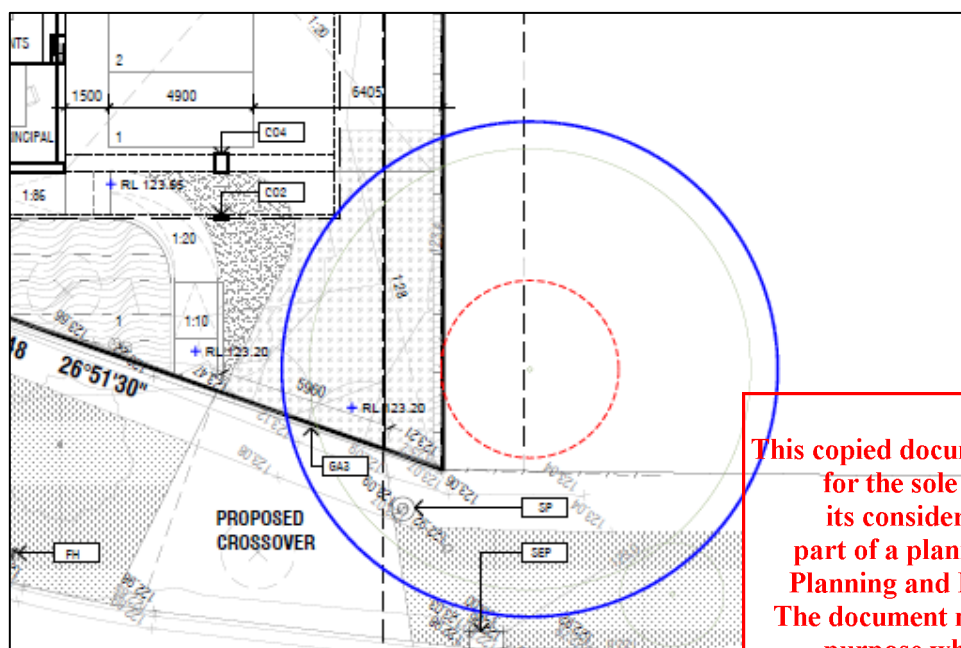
Hatching on site plans shows permeable surface to be installed within TPZ of Tree 2.
